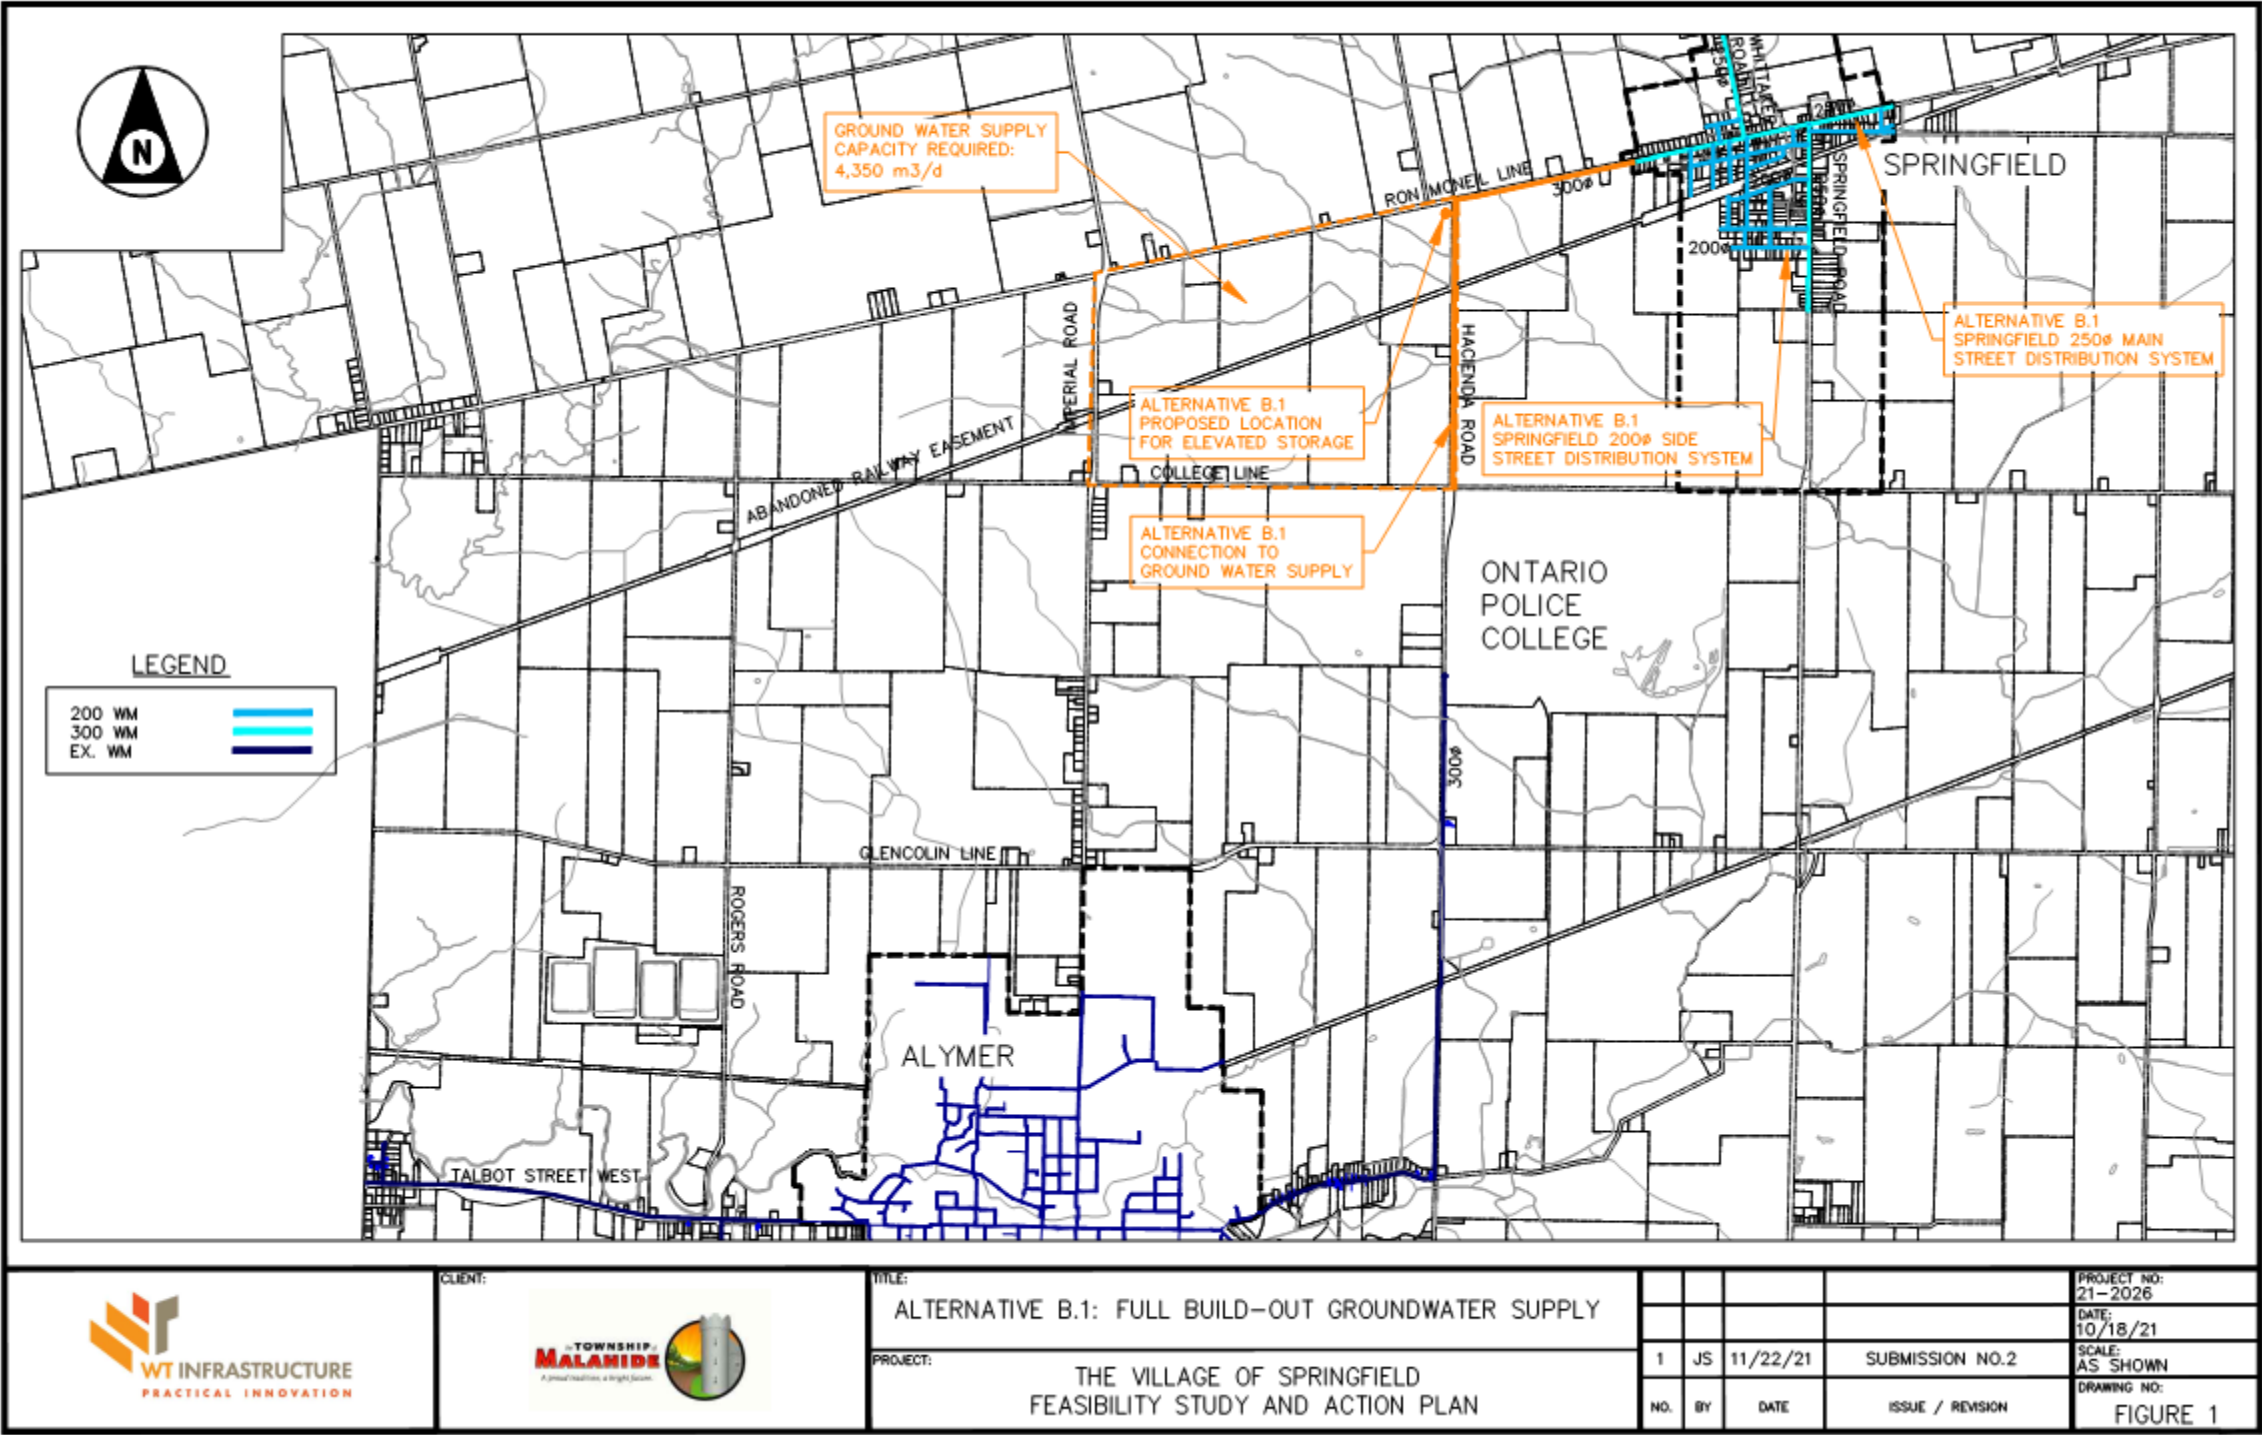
Alternative B.1: Full build-out groundwater supply.
